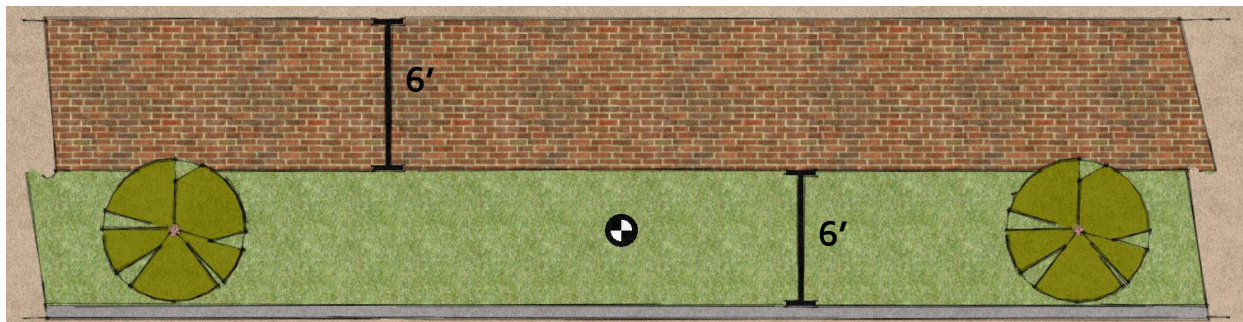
Commercial Downtown Streetscape Plan – At-grade Planting Bed Design
